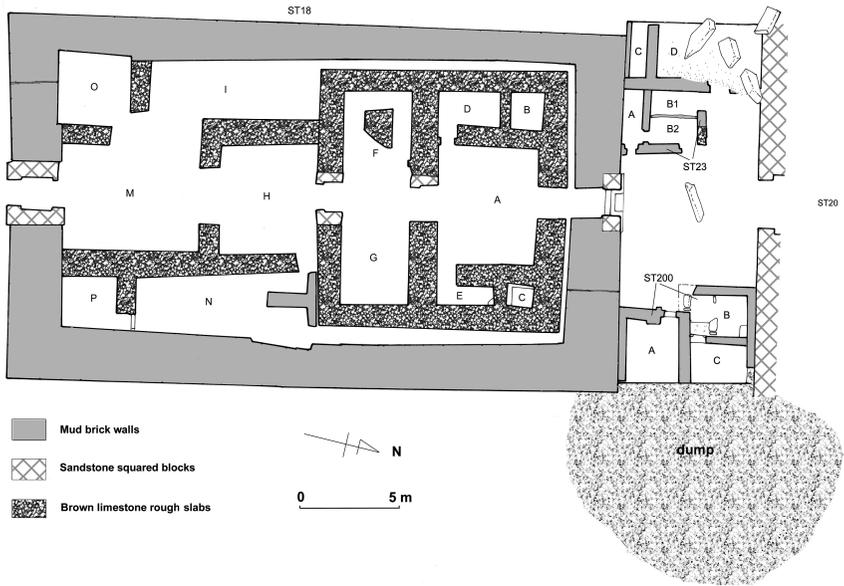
Soknopaiou Nesos, plan of ST 18 and the excavated sector (2004).
